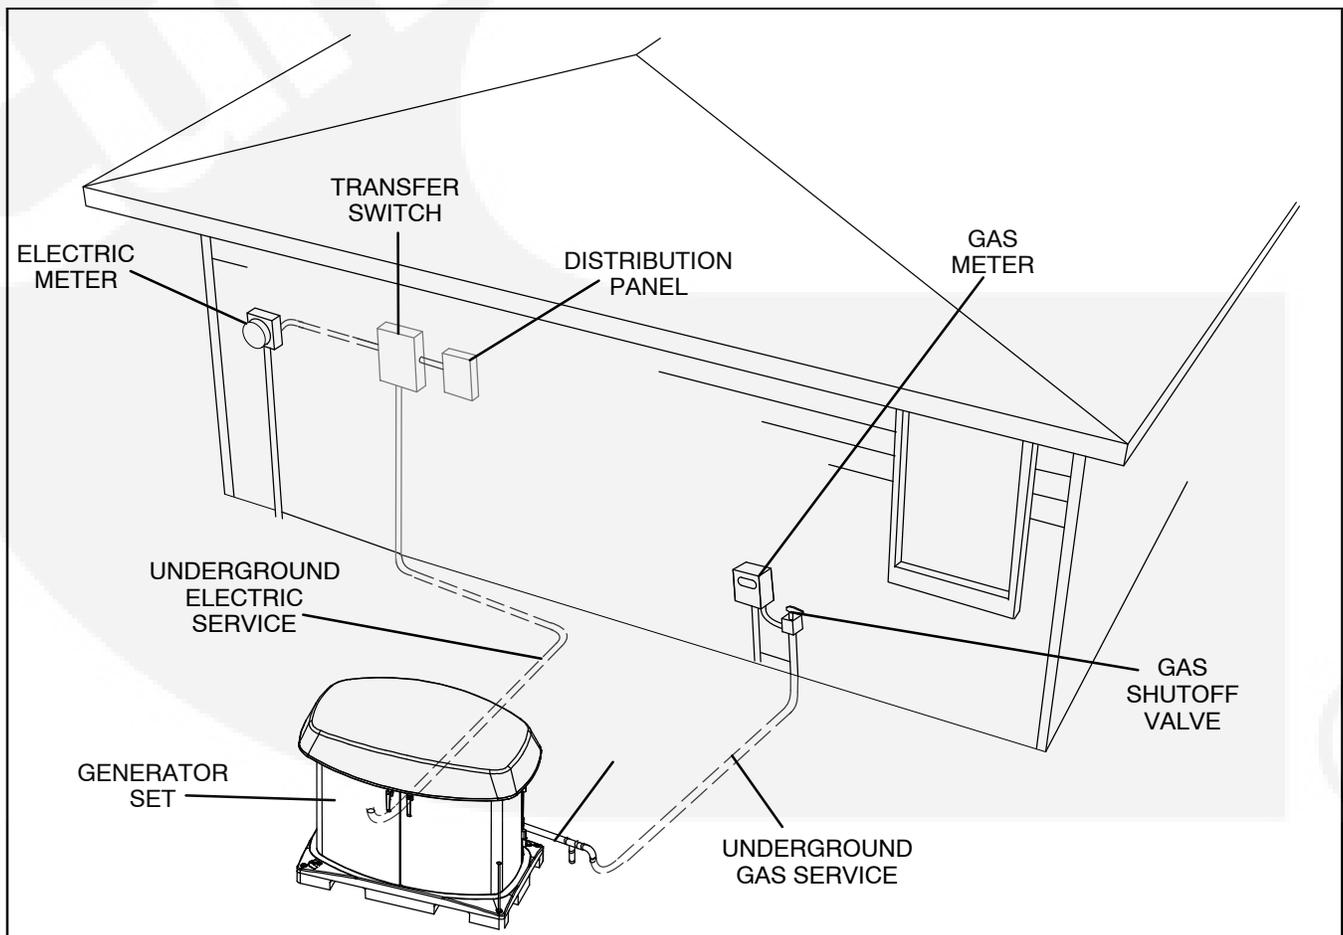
TYPICAL GENERATOR SET SITE
